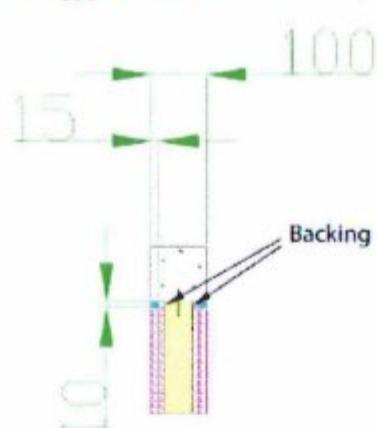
wall gypsum to stone thickness  $\geq 75$  mm
